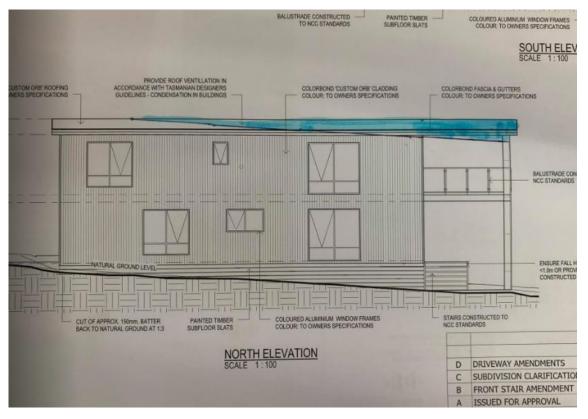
Extent of protrusion from the building envelope at the northern elevation (adjacent to 40 Gordon Street)
